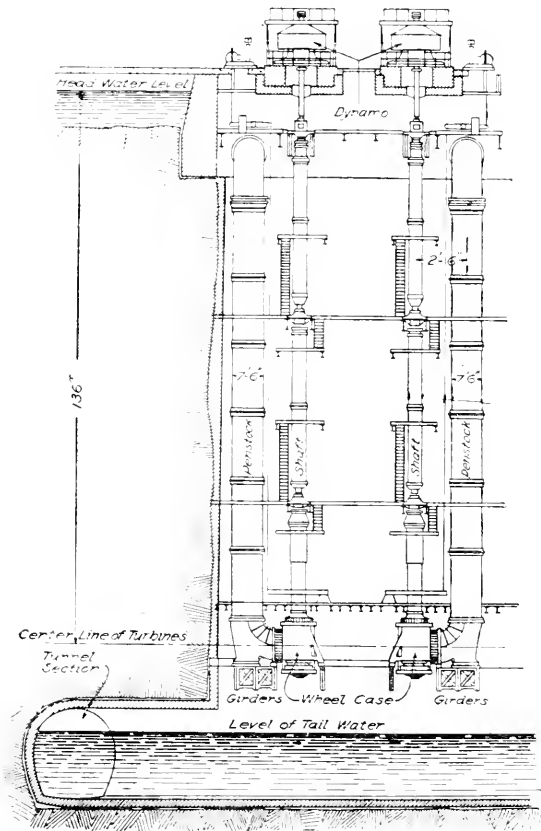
Longitudinal Section through Portion of Wheel-Pit of Power-House No. 1, Niagara Falls Power Company.
